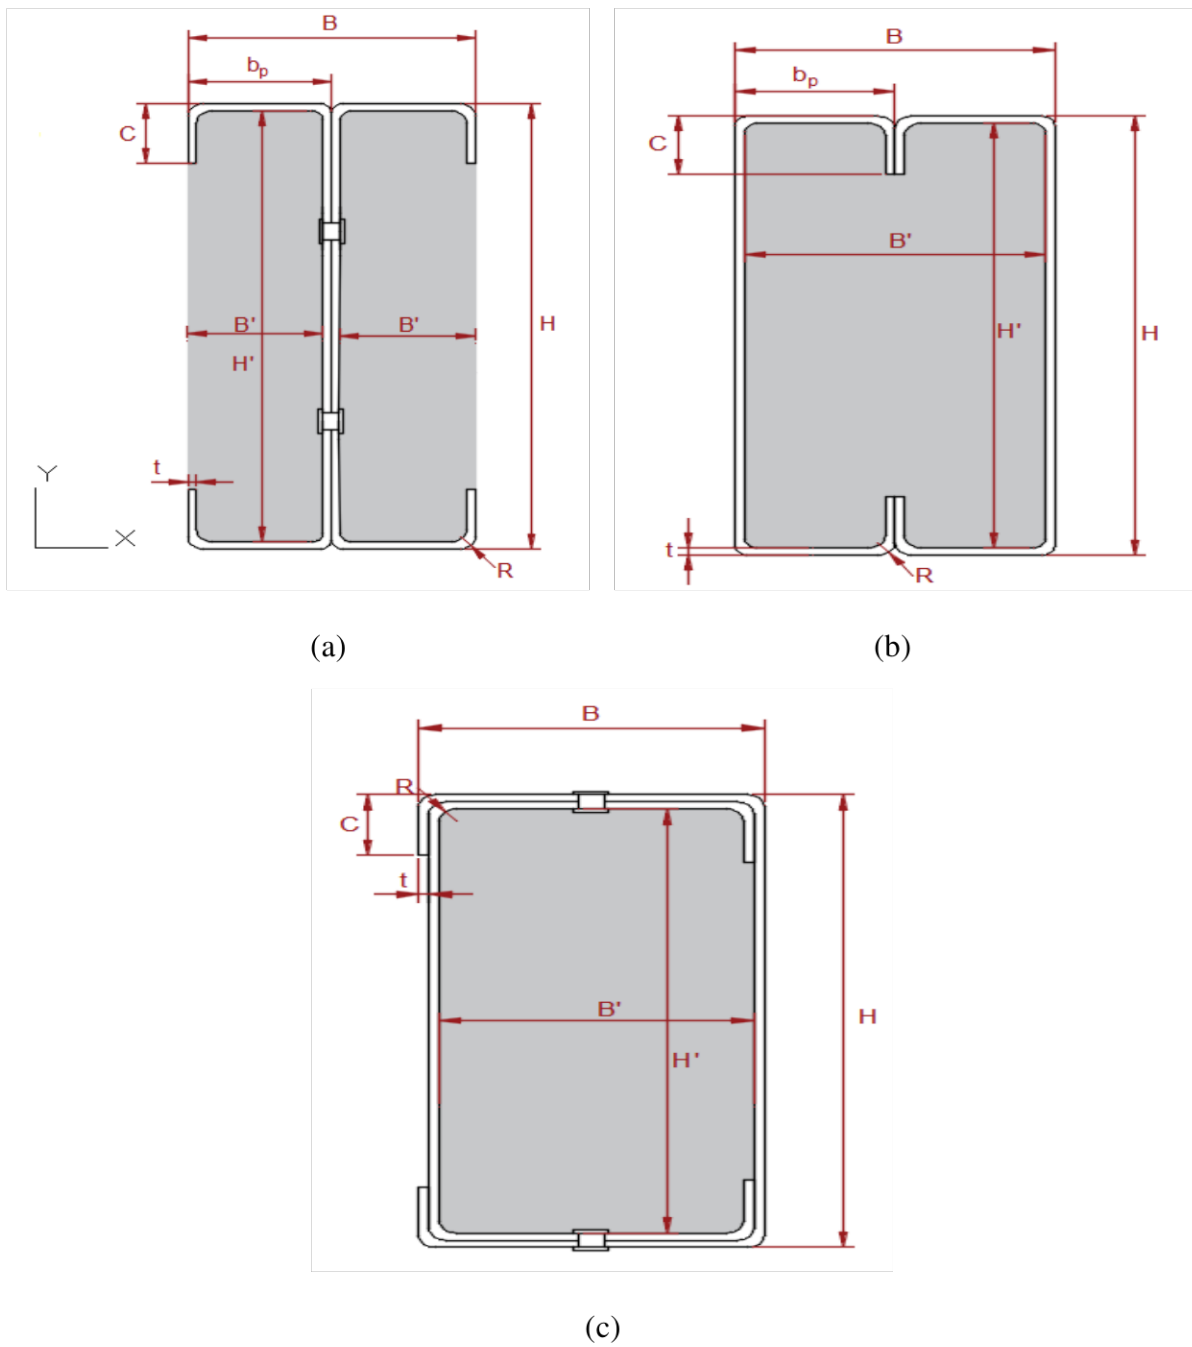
Cross-section of concrete-filled models: (a) Back-to-back partially encased with concrete; (b) Face-to-face filled with concrete; (c) Box filled with concrete.
